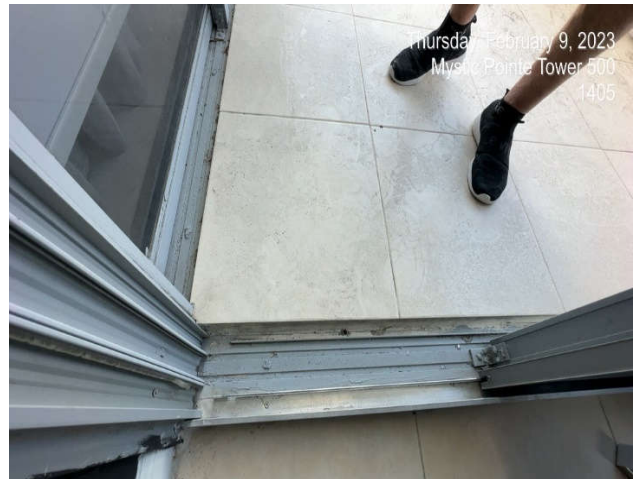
b.4 – Tiles level is above the sliding glass door frame level (Unit 1405)
